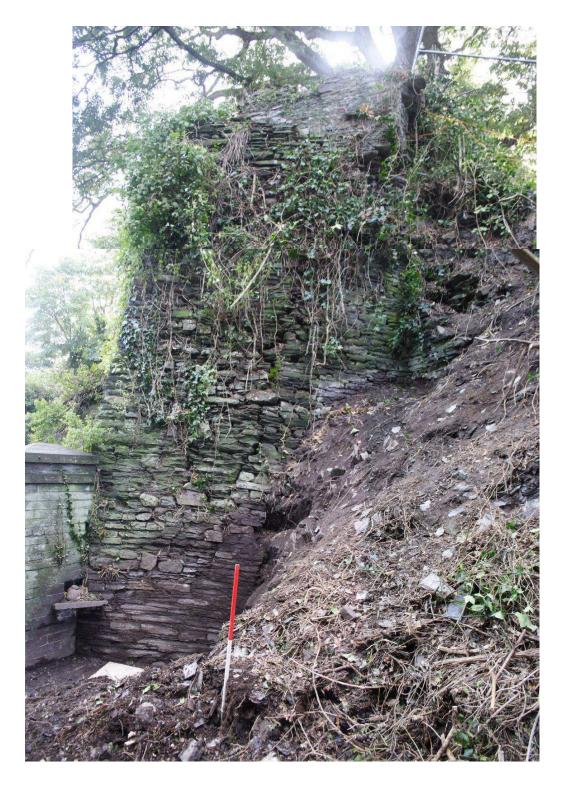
Composite photo of the northern elevation of the North East Bastion wall, 1m scale
